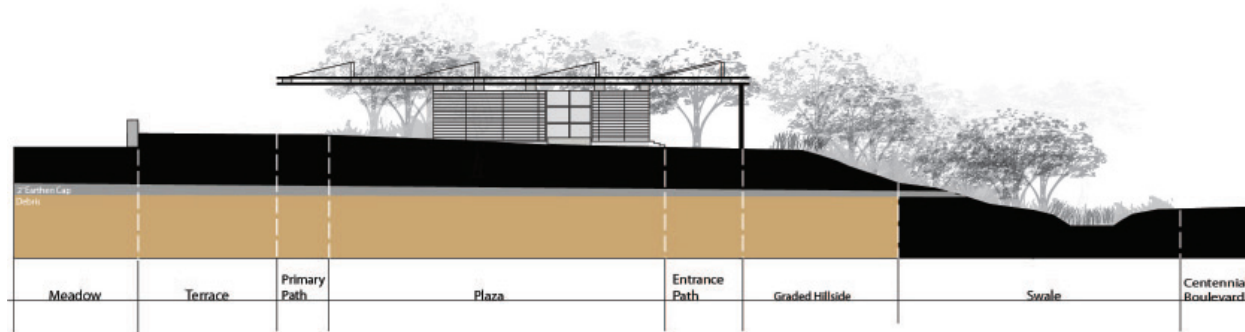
Section looking South-West cut through Central Plaza and Terrace
